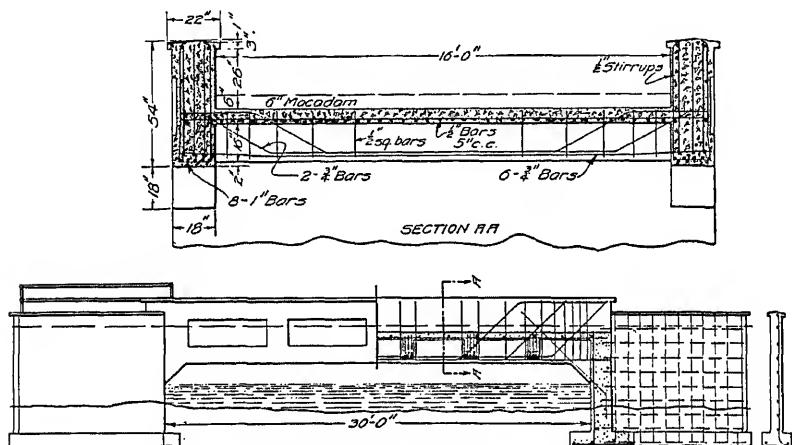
Details of Girder Bridge near Allentown, Pennsylvania
